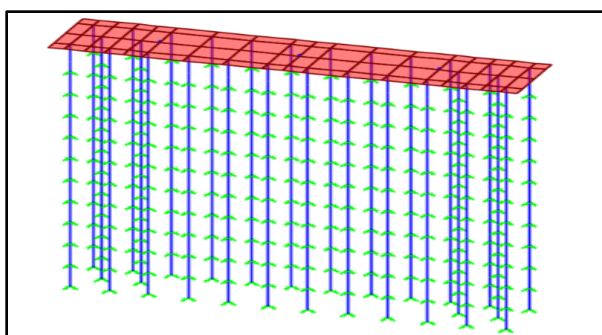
Typical Foundation Model in CSiBridge
